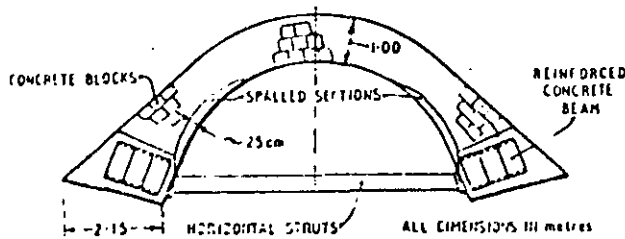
Roof-arch failure in a clayey-mylonite section of the new Semmering tunnel. The masonry consists of shaped concrete bricks, and high early-strength cement was used for these and for the reinforced-concrete beams
